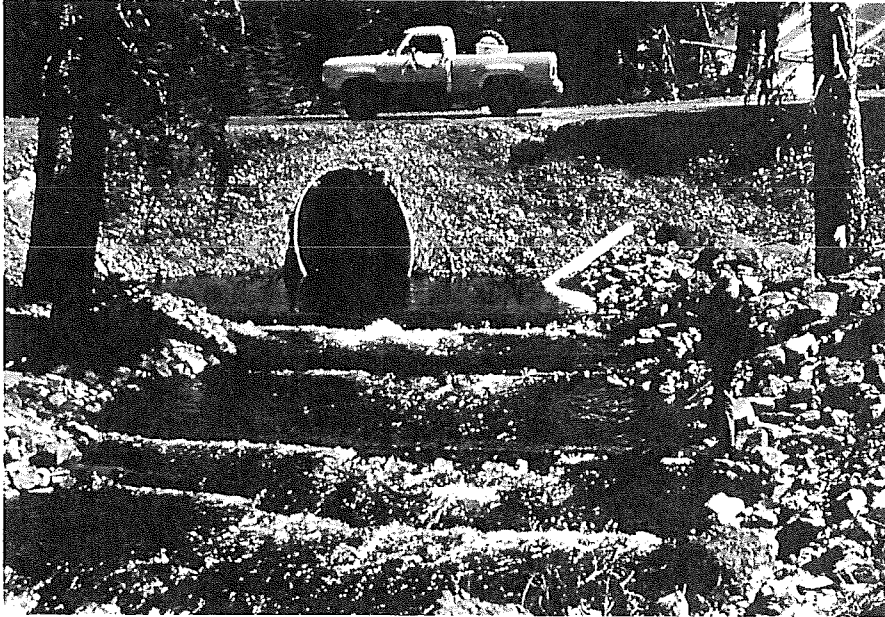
Series of low-head dams that prevent a road culvert from being an outfall barrier to upstream fish migration.
